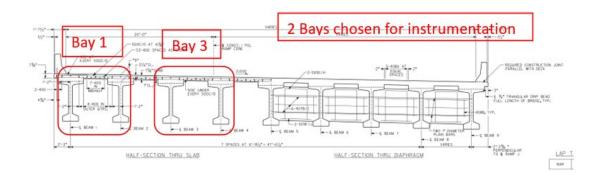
Drawings. Deck plan of Span 14, Bridge 11B
